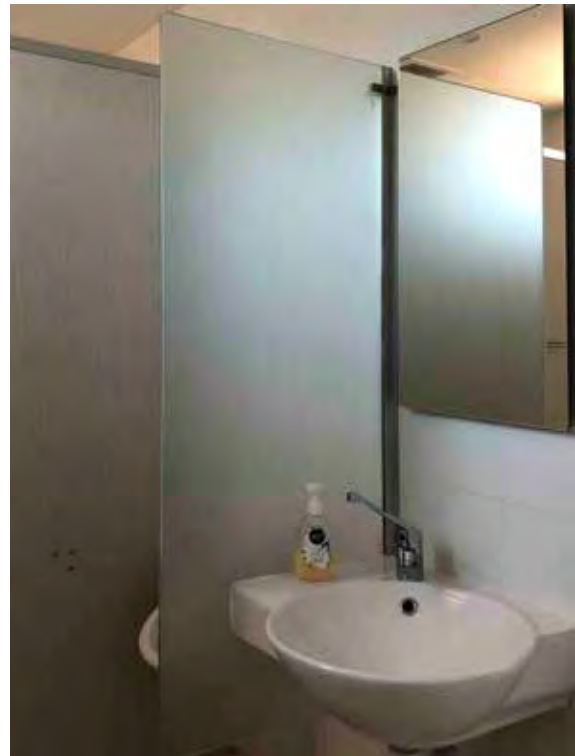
| *Some toilets - those on the first floor - were recently refurbished.
